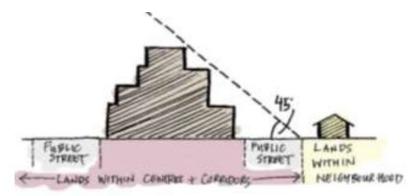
Angular plane when a street separates Neighbourhood designation from Centre or Corridor.
